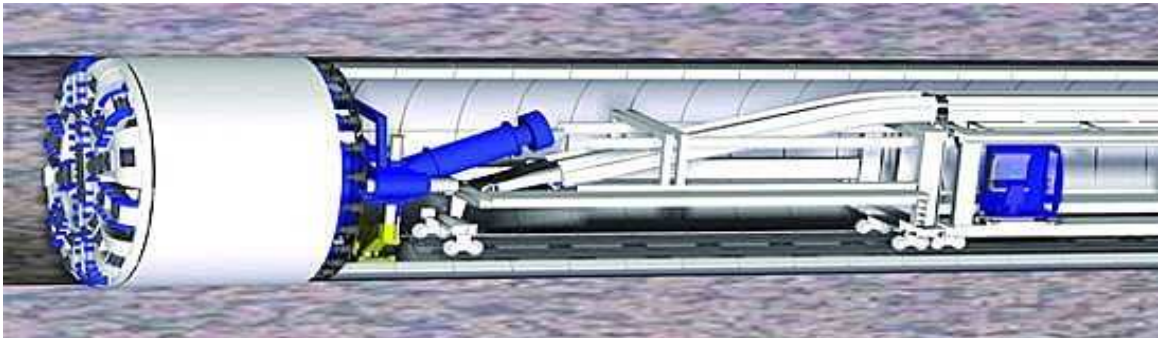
Earth Pressure Balance Tunnel Boring Machine
